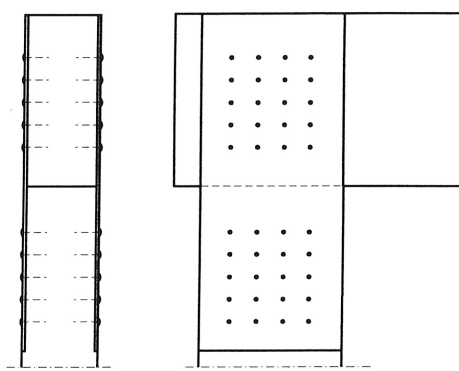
Joint with nailed gusset plates of steel or plywood. The joint can take up some moment and thereby contribute to the lateral stability of the structure.
